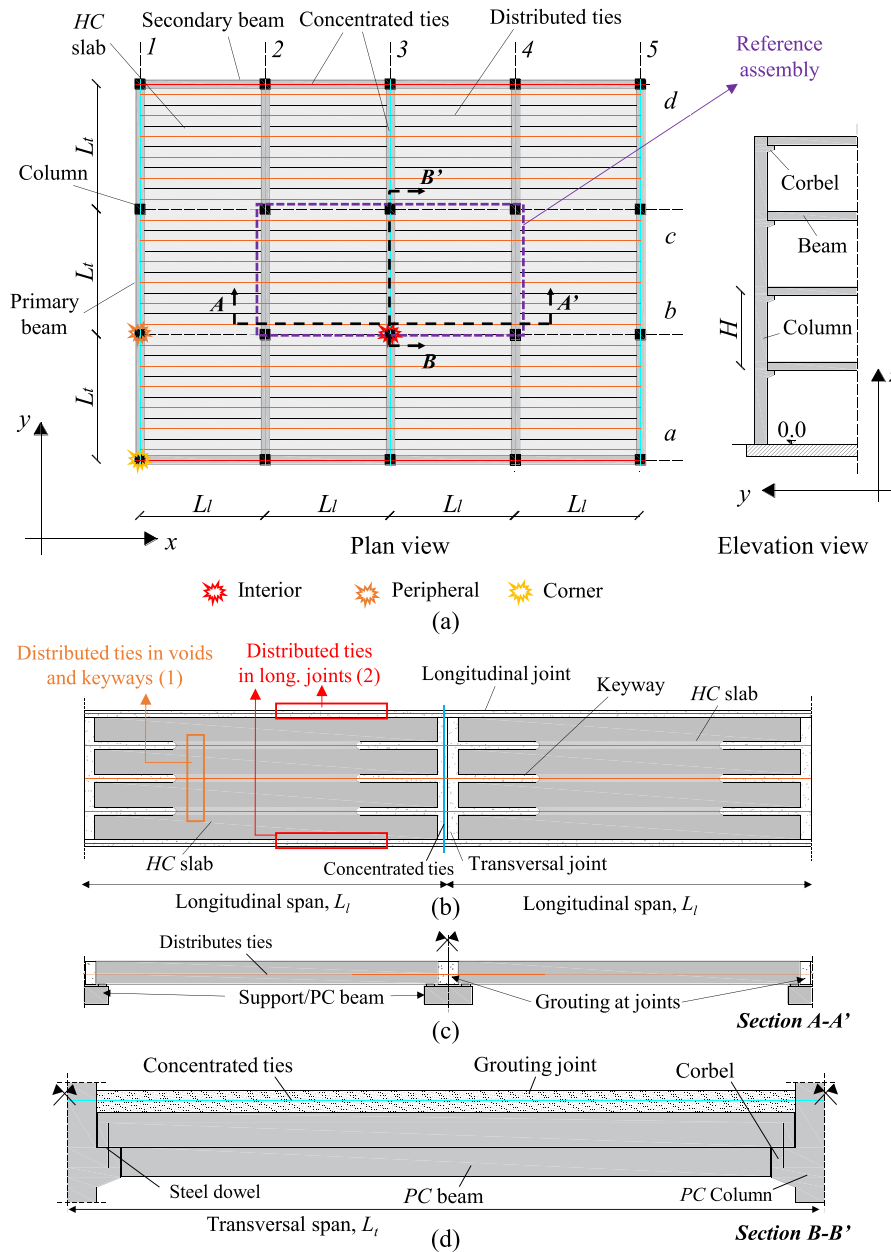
Schematic view of (a), (b) PC building with column loss scenarios and distributed ties in floor slabs, (c) double-span HC floor units, (d) transversal PC beam with ties.
